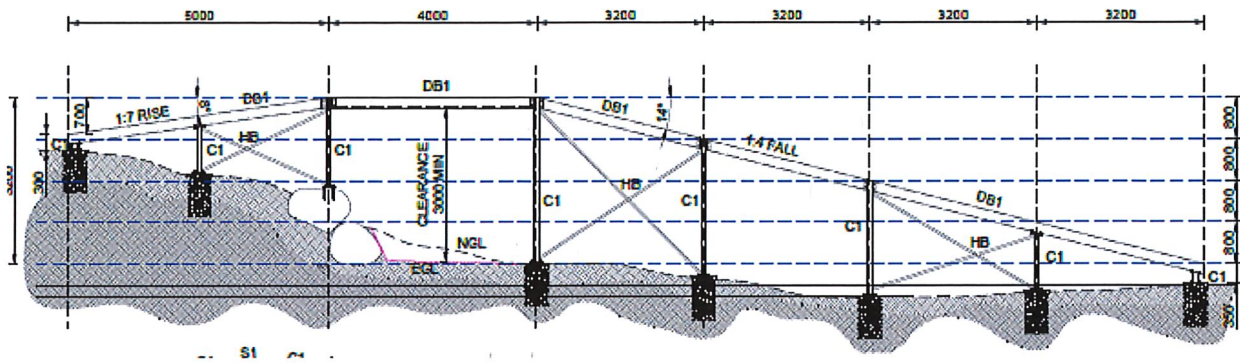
Proposed overpass structure (Source: Applicant's SEE)
